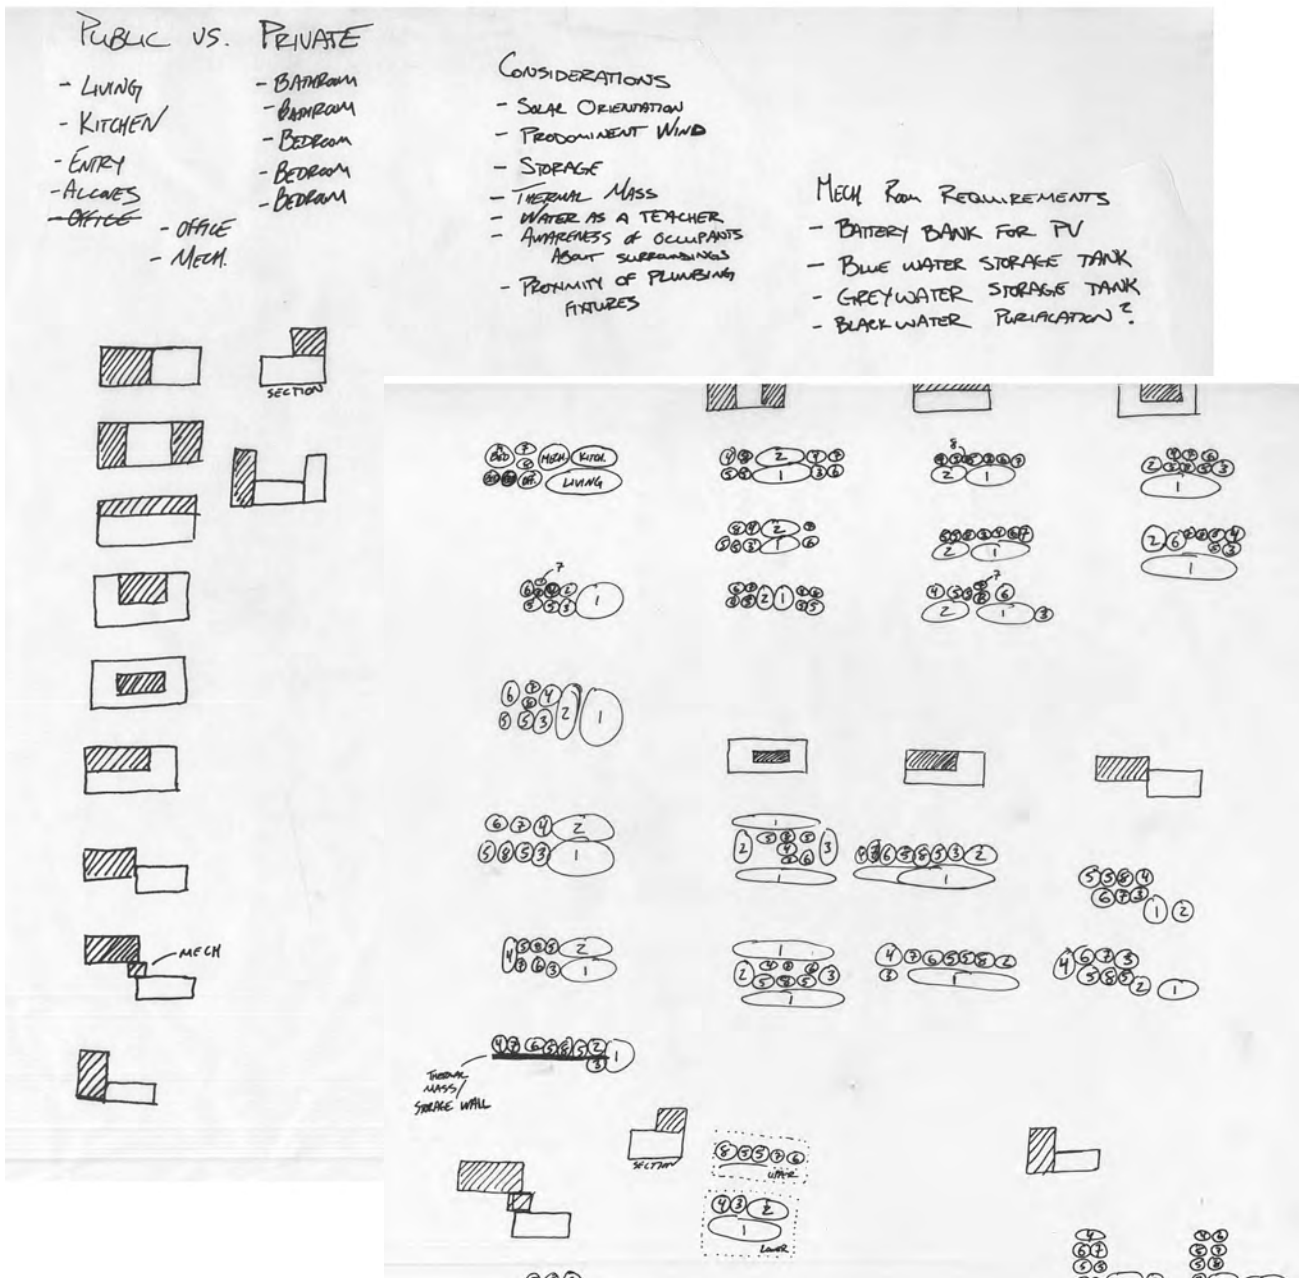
Public | Private and Arrangement Sketches [Images by Author]
